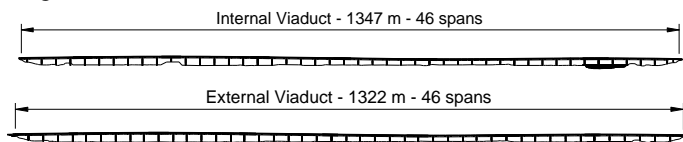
Internal viaduct elevation (top) and external viaduct elevation (bottom)
